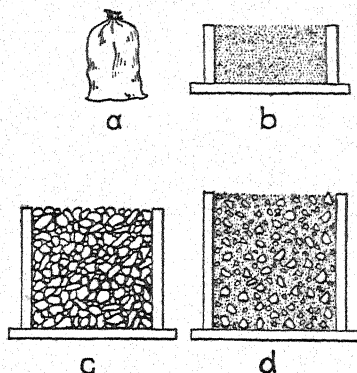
Typical concrete mixture. *a.* Bag of cement. *b.* One-half cubic foot sand. *c.* One cubic foot cracked stone. *d.* One and one-eighth cubic foot concrete. (After Alpha Portland Cement Company.)
